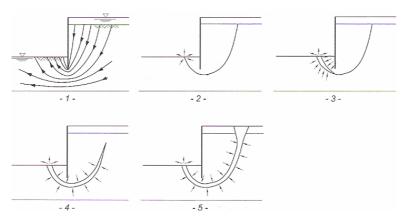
Piping mechanism, piping occurs for the shortest distance between two water levels, not as in this picture!
